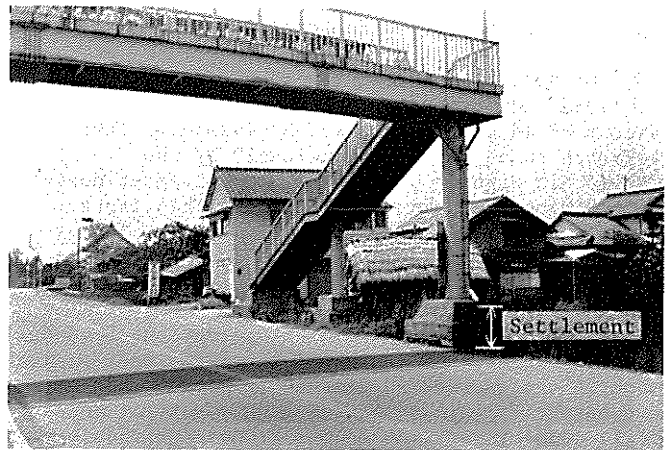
Differential Settlement of the Pavement to the Foundation of a Pedestrian Bridge, after Over-laying Work
